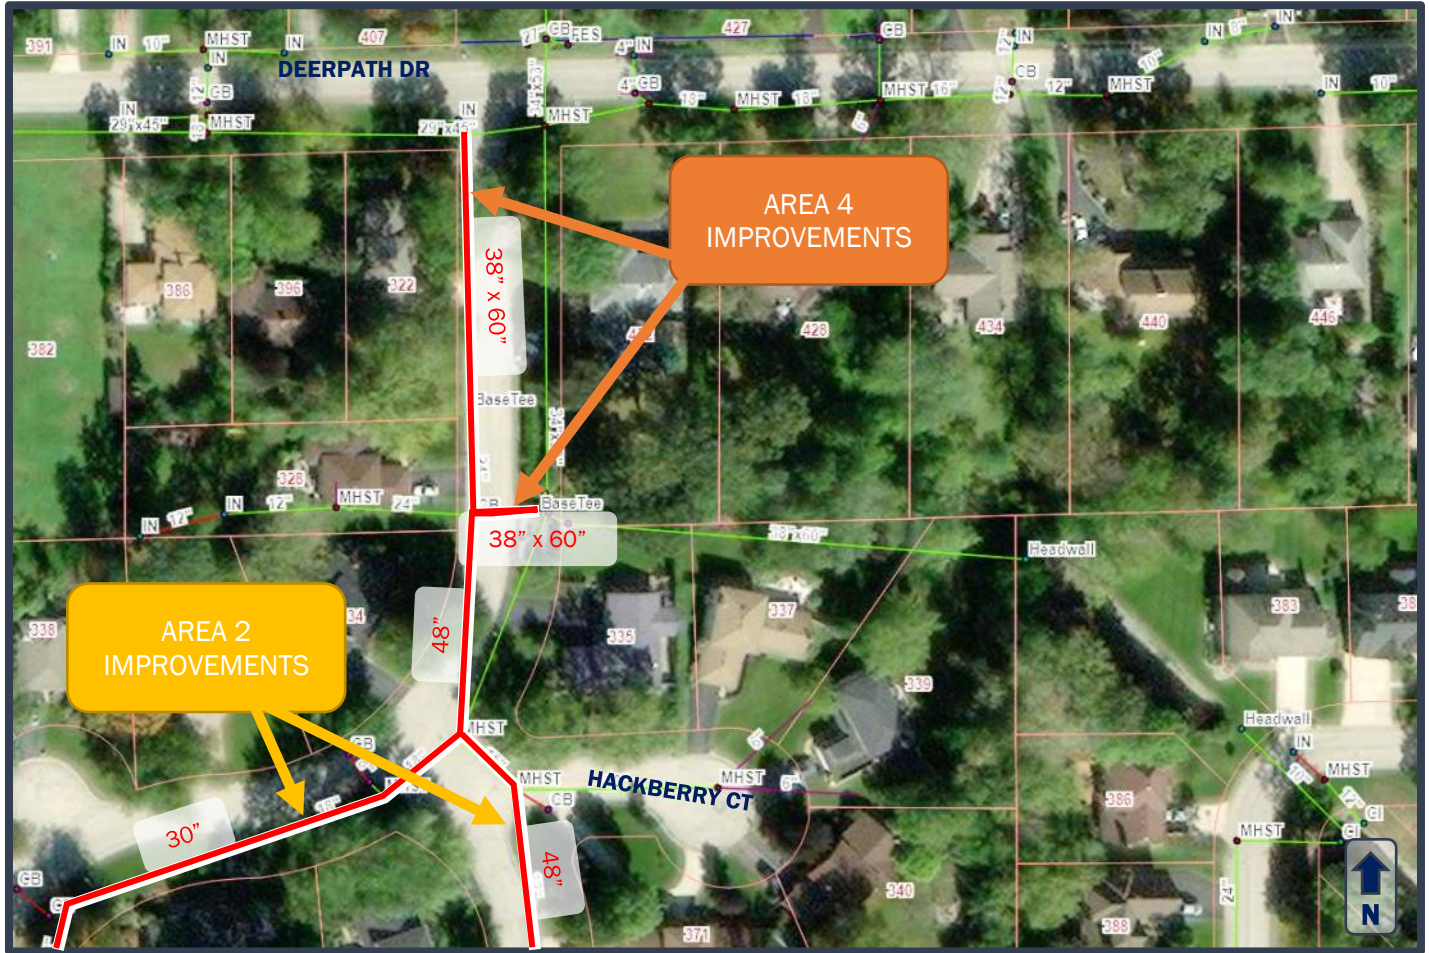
Proposed storm sewer improvements in Area 4 along Edgewood to Woodside Subdivision ponds.
